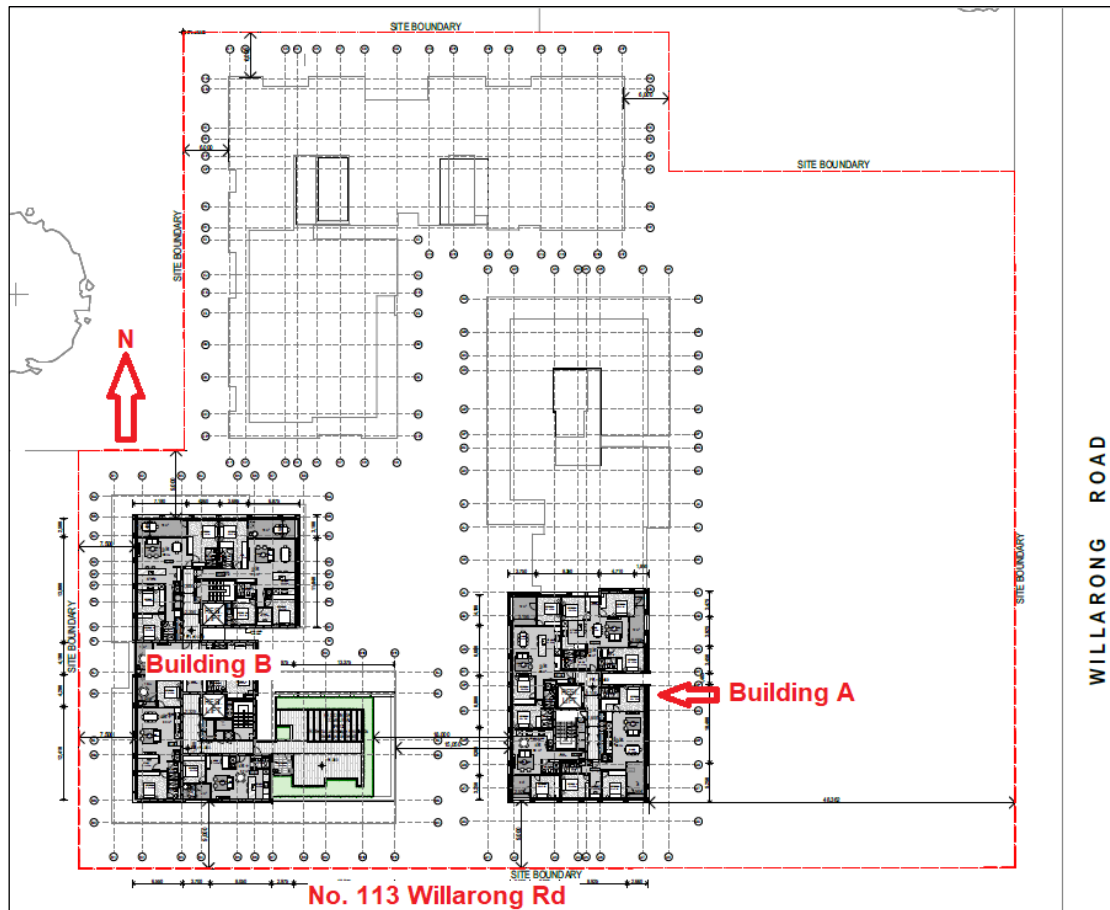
Level 7 (eighth storey) floor plan of Building's A and B
